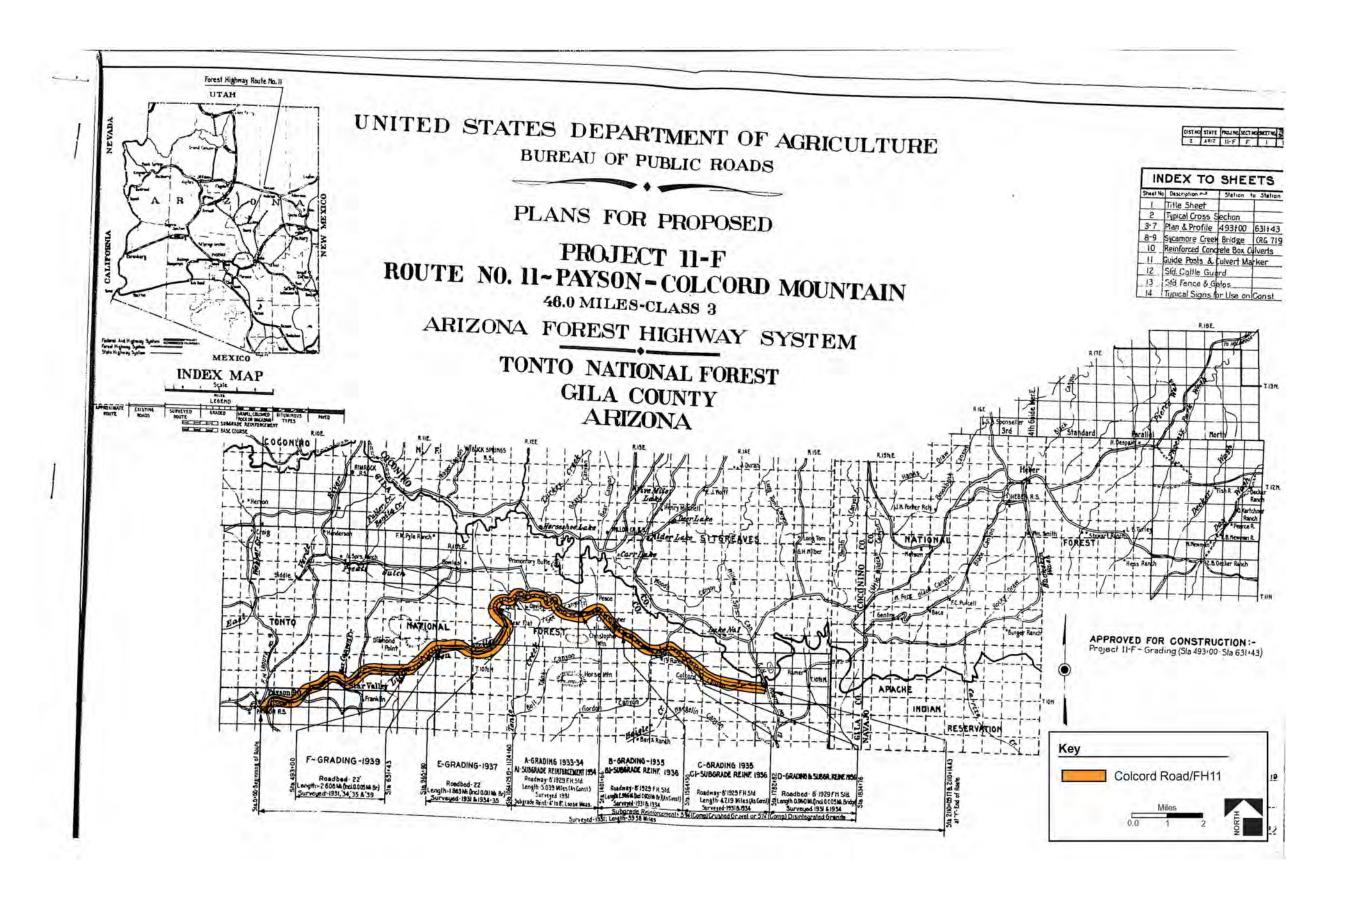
1939 Bureau of Public Roads as-built plan showing CCC improvements to the early alignment of FH 11.
